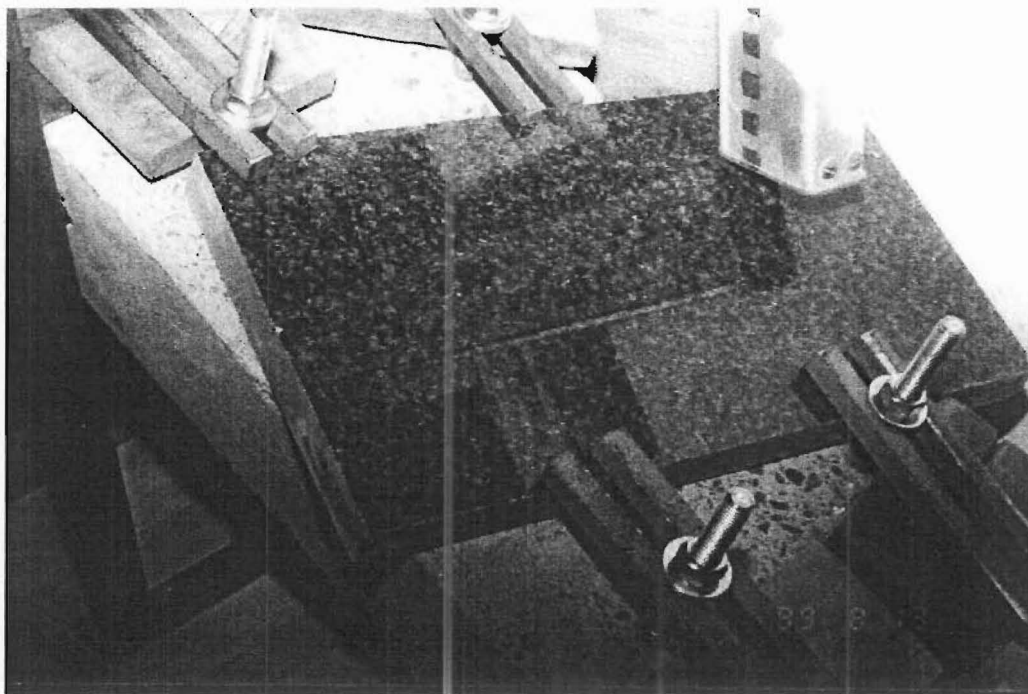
Rock slab clamped on concrete deck for rockfall laboratory test
